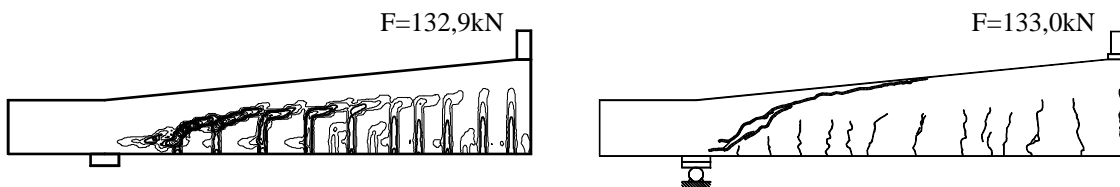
Crack propagation at failure of test beam 3L1 from Non-FEM and test
